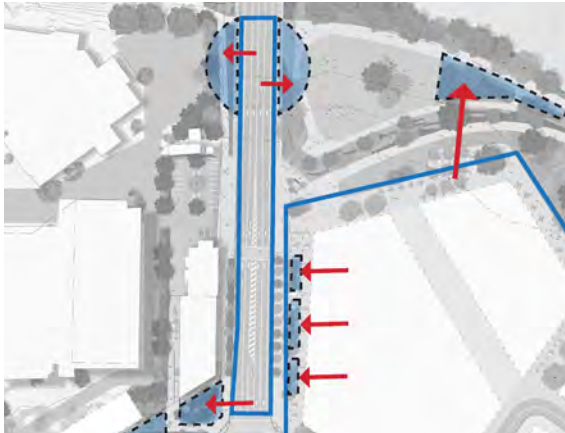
South Congress Avenue stormwater concept showing how runoff from rooftops and roadways could be treated in green infrastructure features.
